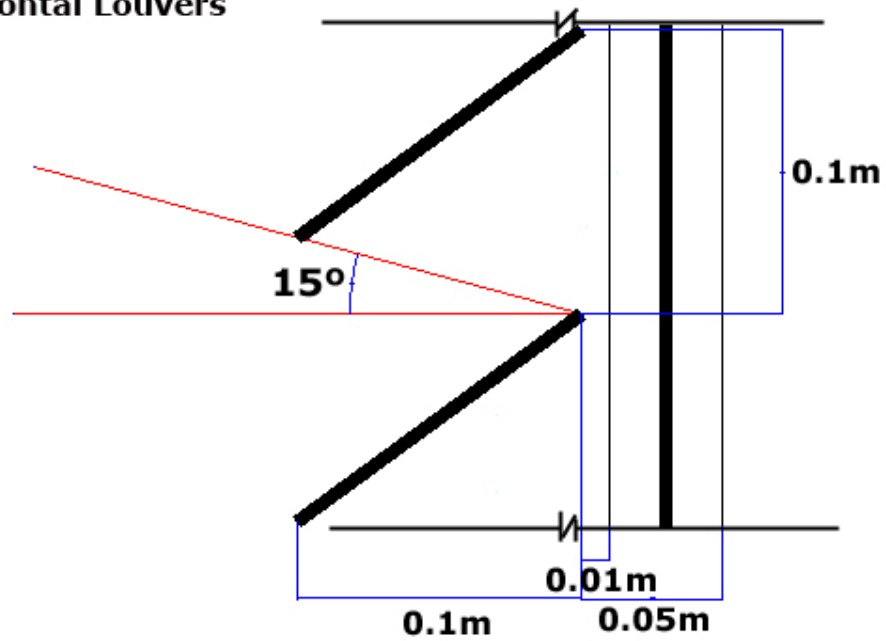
Dimension of shadings for southwest facing opening in Building 4
